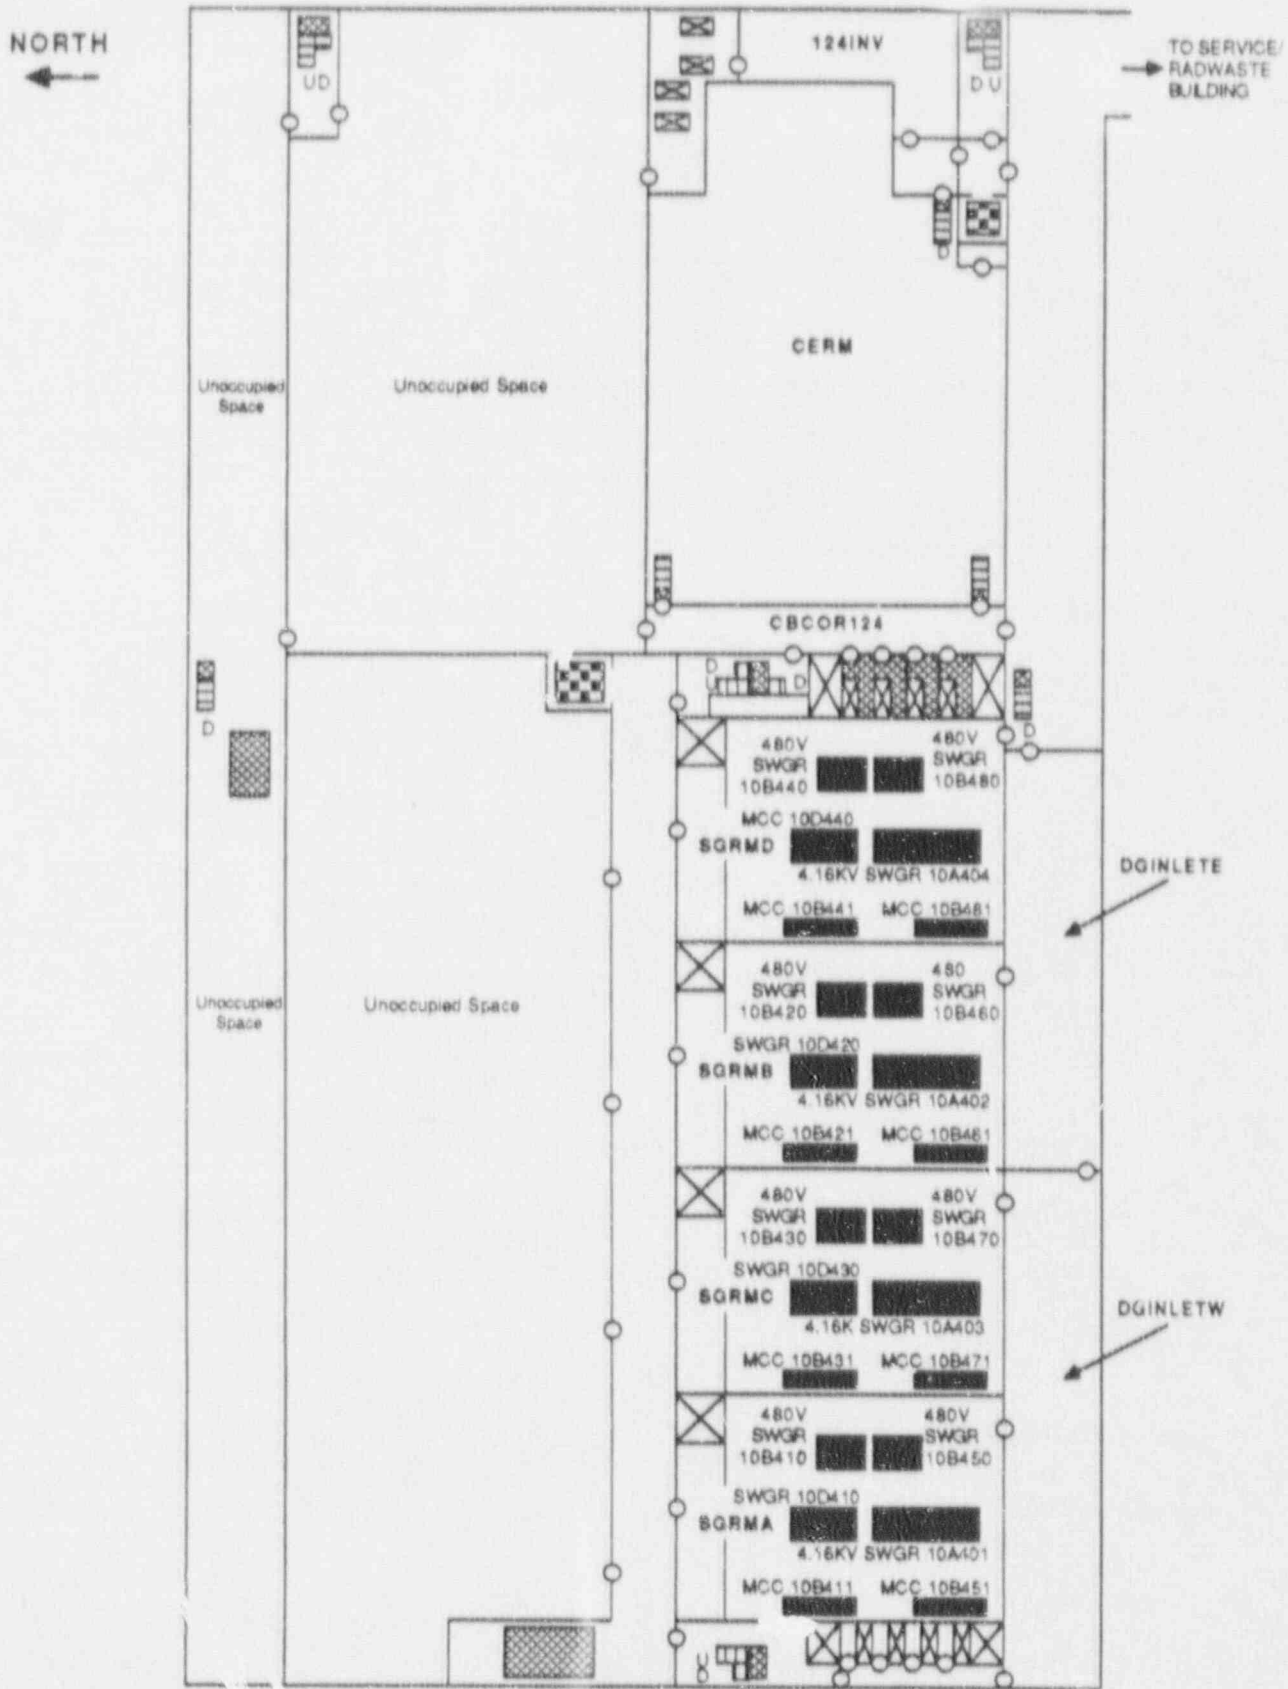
Hope Creek Control/Diesel Building Elevation 124'-0" and 130'-0"
